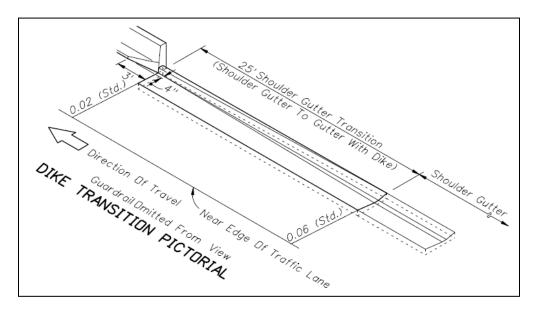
Shoulder Gutter Transition at Bridge End
